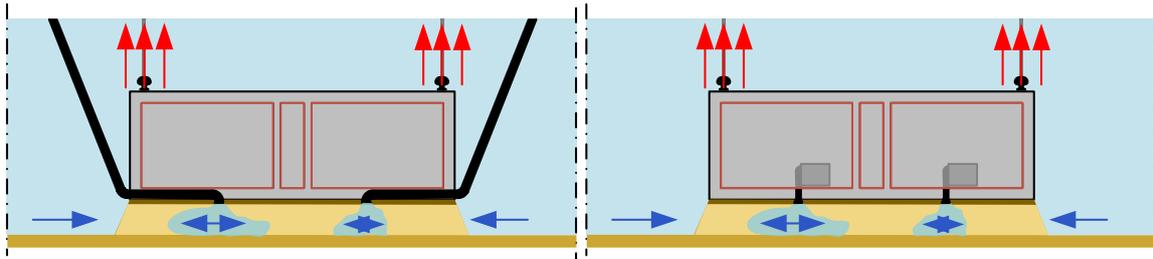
, BREAKING SOIL ADHESION VARIANTS (2/2) ; LONGITUDINAL VIEW
